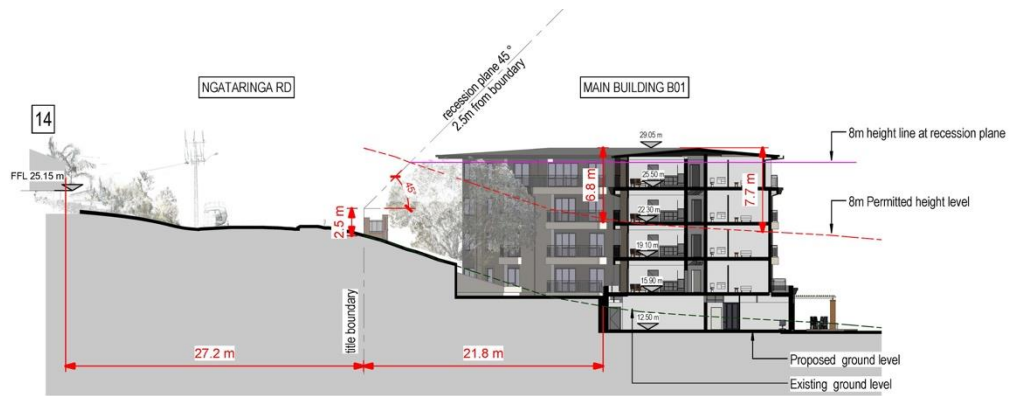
Section B through Building B01 (Ryman Drawing A3-020 RC11).
